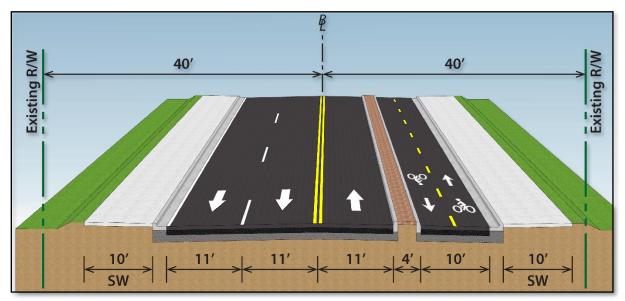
Proposed Typical Section – Whiting Street (Jefferson Street to Brush Street)
